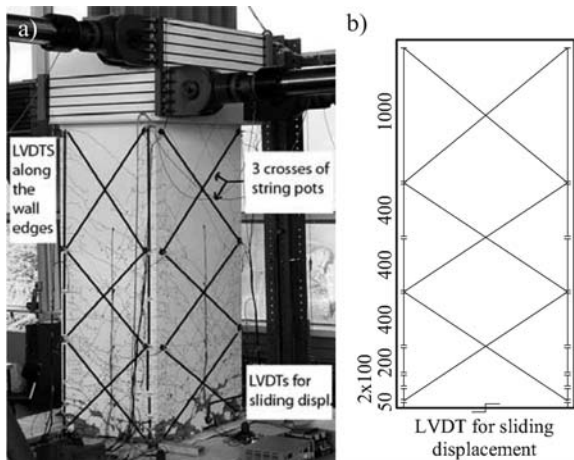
Instrumentation of U-shaped walls⁷: (a) instrumentation suitable for determining different displacement components Δ_f , Δ_θ , and Δ_s (photo); and (b) sketch of instrumentation of one flange. (Note: all dimensions are in mm; 1 in. = 25.4 mm.)
